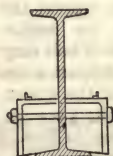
Wooden Beam Framed to I Beam with Duplex Shelf-hanger
